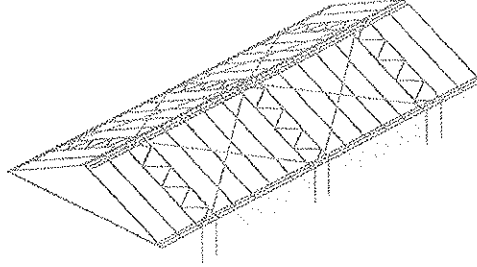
A wide building where the heads of the trusses are braced laterally against stability failure in the roof plane during snow load by the (not shown) battens. The bracing system to which the battens are connected consists of a number of trussed beams between pairs of trusses. For the failure mode with half wavelength l , stringers near ridge and foot of the trusses ensure that reactions at the end of each head can be taken to the ends of the trussed beams, where they will be equalised by the oppositely directed forces in the battens. For other failure modes the resulting force in each batten will be equalised via the trussed beams by oppositely directed forces in other battens.
